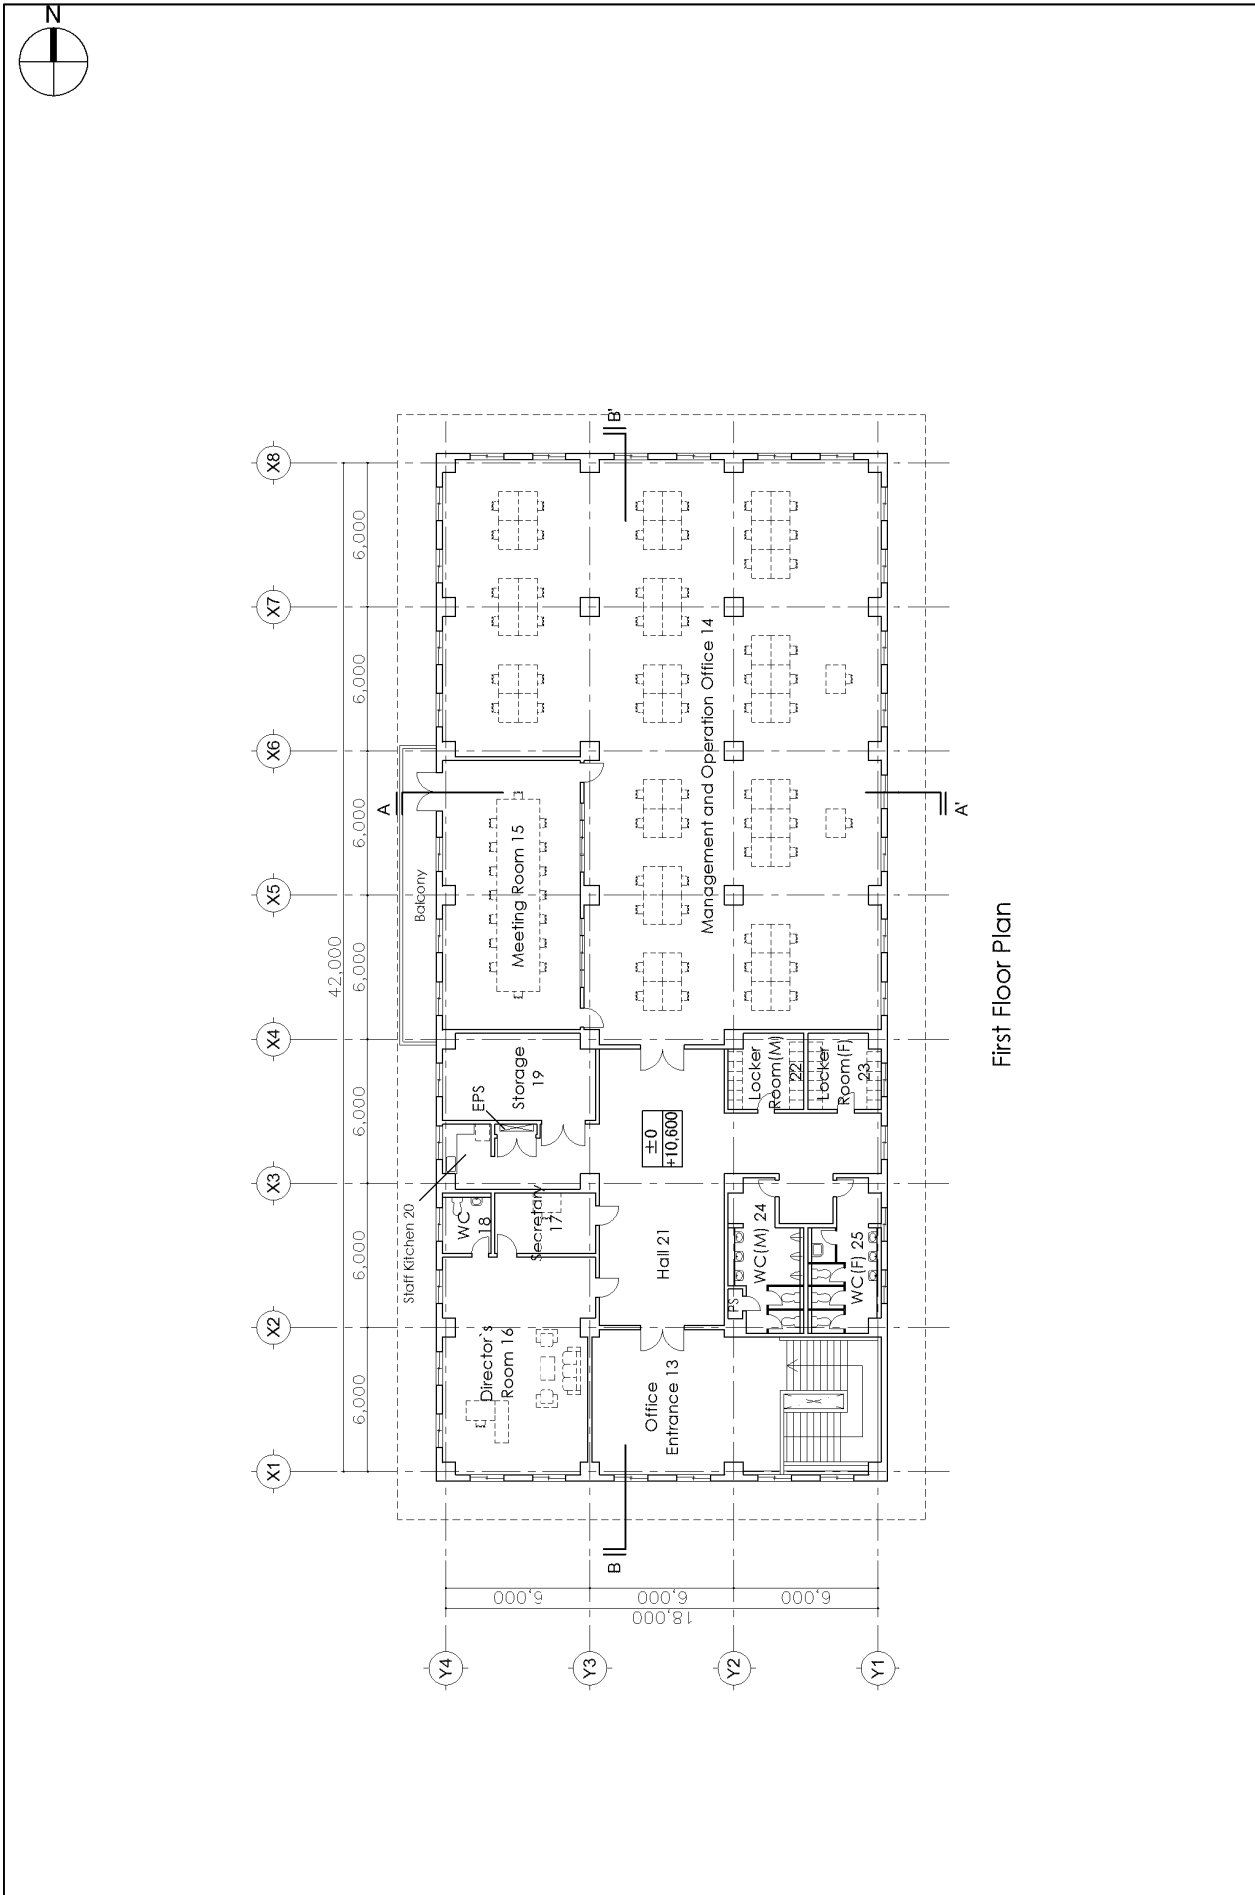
Port Office/Workshop First Floor (Port Office) Plan
